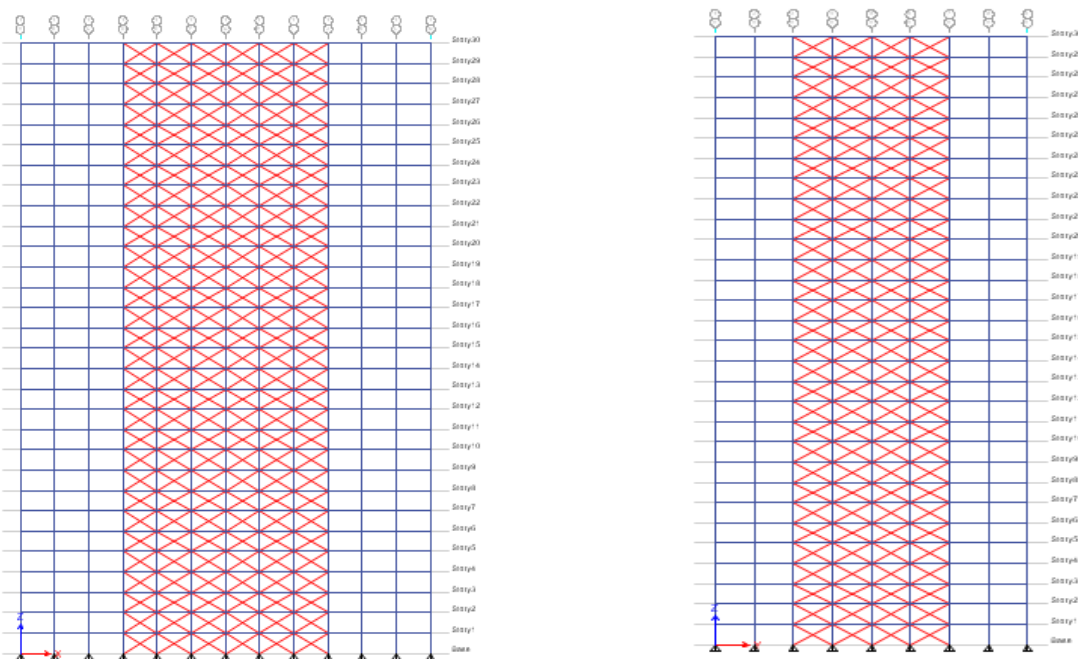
Elevation of tube in tube structure with X bracing in X and Y direction
